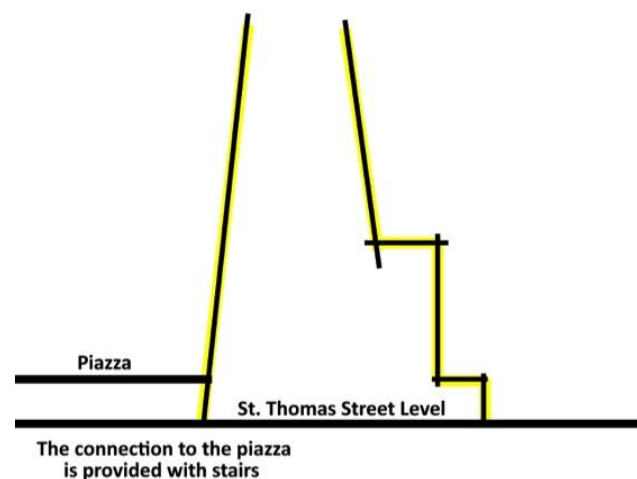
Site leveling (Drawn by Author) Figure is not scaled
